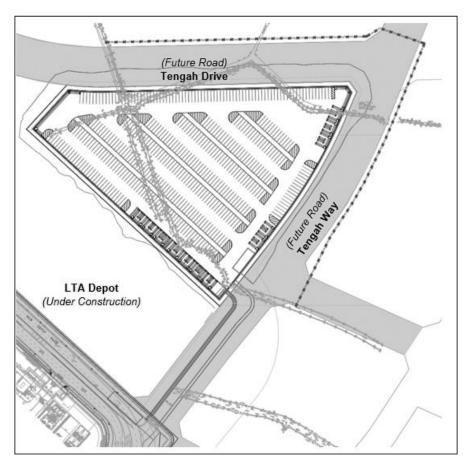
Site layout plan for Tengah HVP (Source: ABL/JTC).
